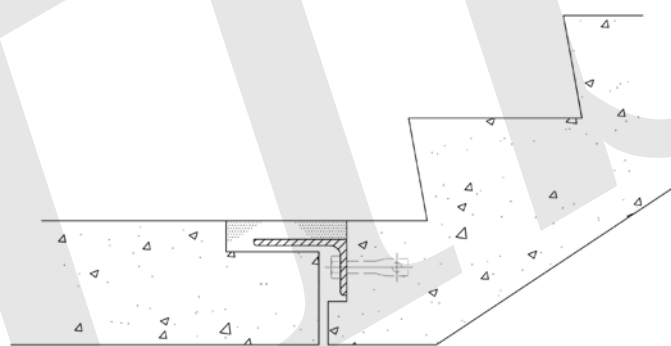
Section through steel angle bearing connection at end of flight.
